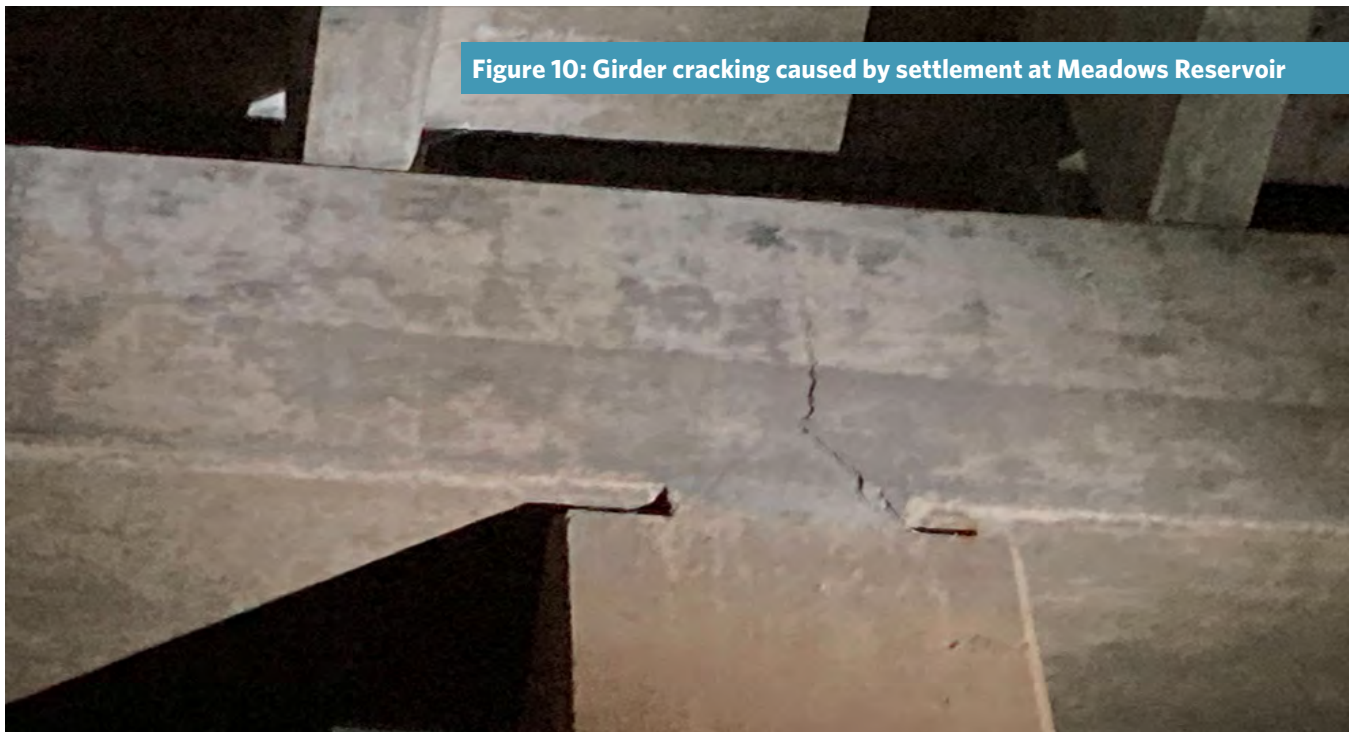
Girder cracking caused by settlement at Meadows Reservoir
